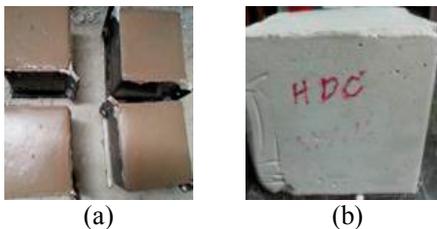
Sample fabrication (a) Hydration process in the mold (b) Finished sample
